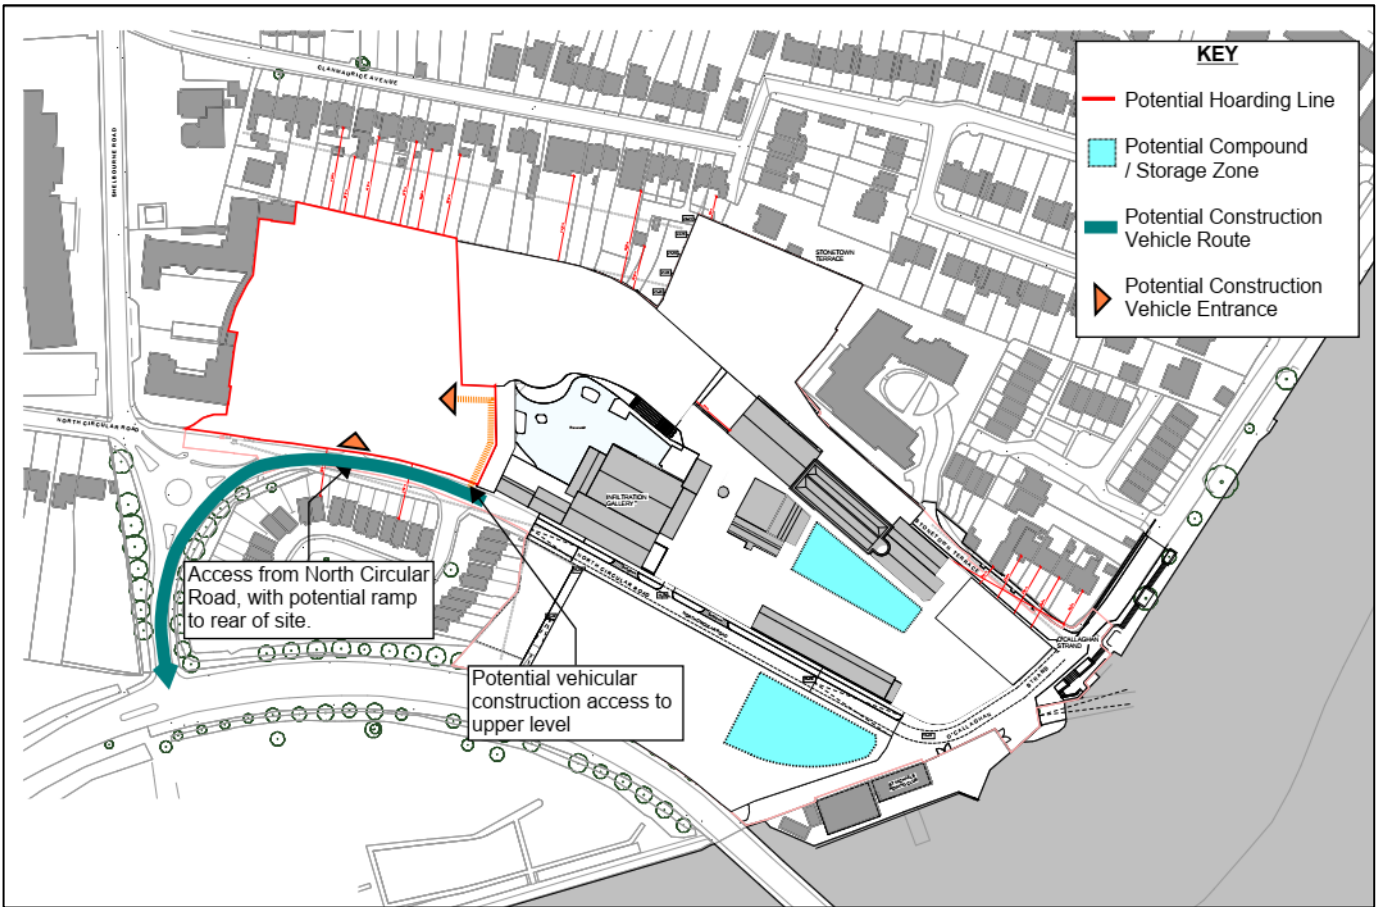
Construction and Logistical Considerations Stage 3 - Flood Protection Works
